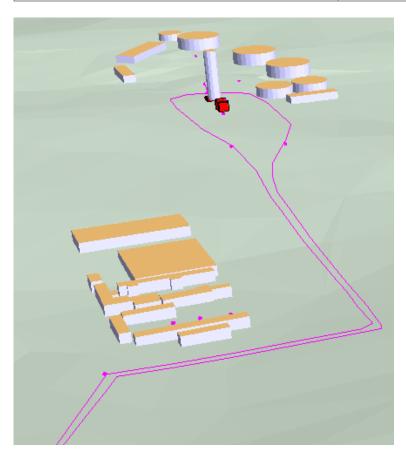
View of 3D model (from south, looking over site sheds towards batch plant)
